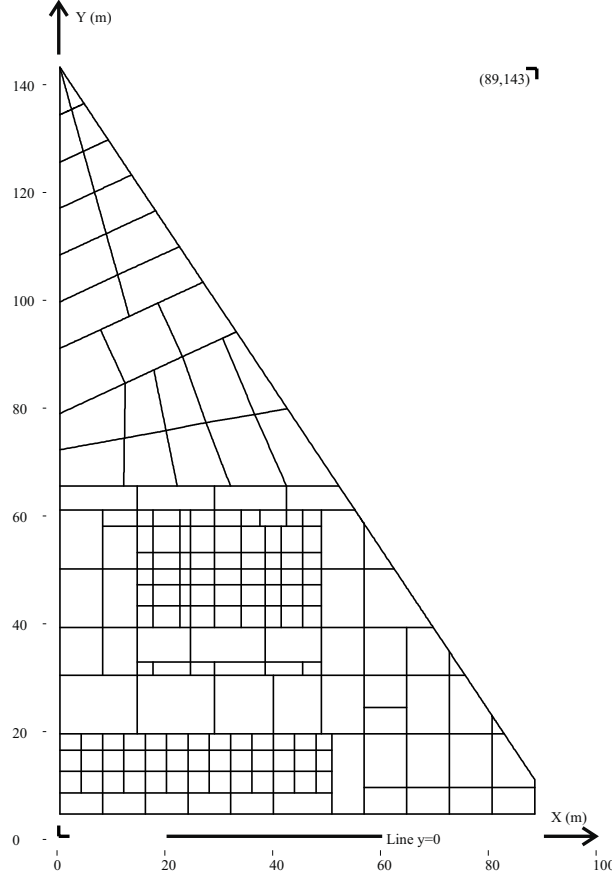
Barberá grounding system: Plan of the grid buried to a depth of 0.8 m.
